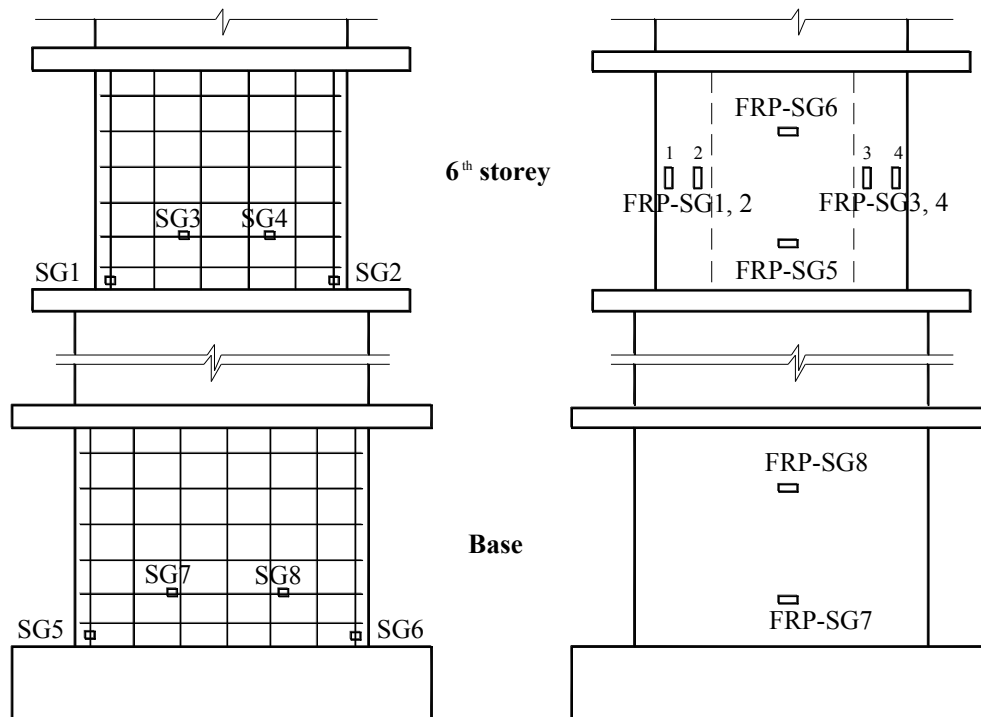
Locations of the strain gauges installed on the steel reinforcement and the FRP sheets at the base and 6th storey panels.
